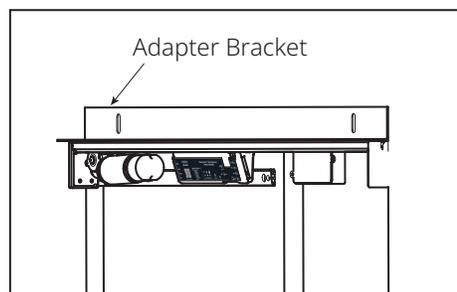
Overhead Mount/Pocket Door System with Adapter Bracket
